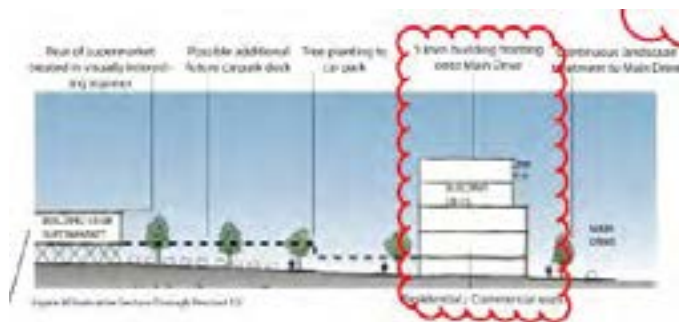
Proposed south-west to north-east section of Building 1B-16 on Lot S3
